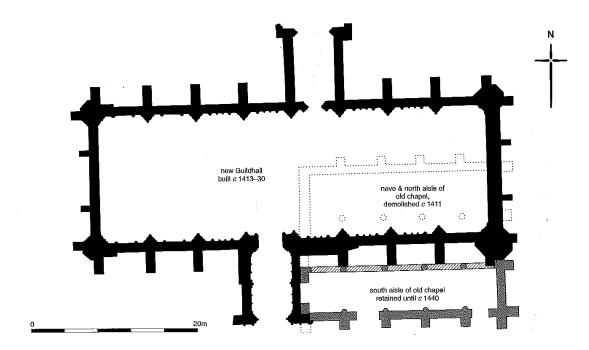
Plan of the new Guildhall built by Croxtone in relationship to the partly demolished old chapel
